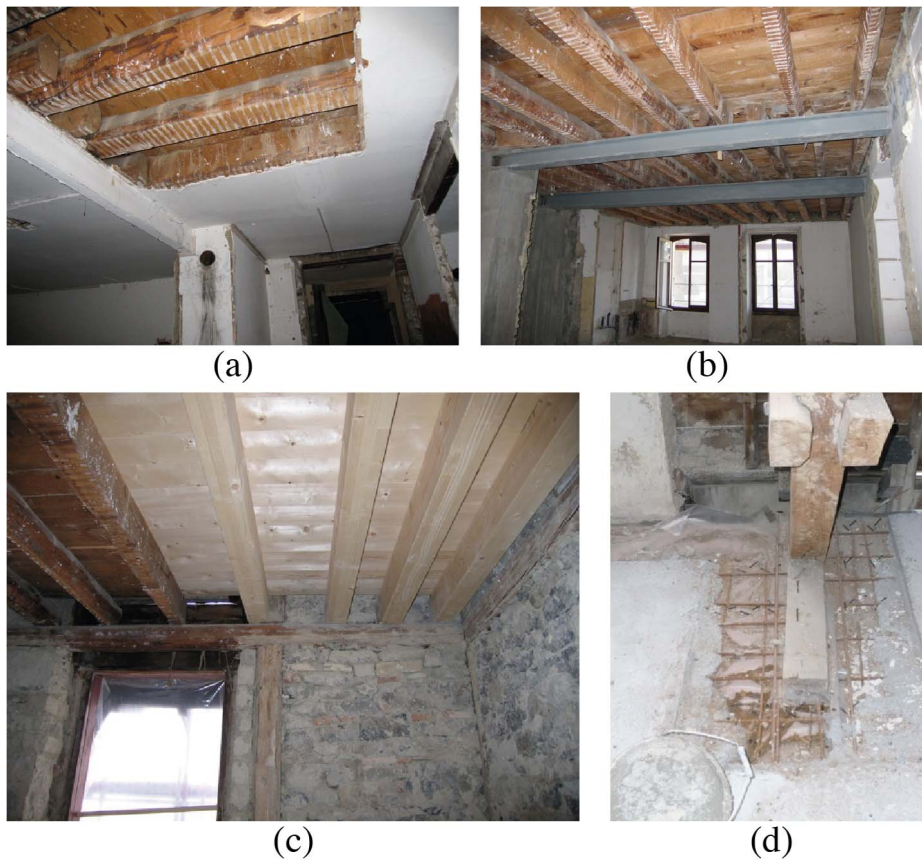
Retrofit of the slabs in the building (a) initial state, (b) added steel beams, (c) renewal of the wooden floors, and (d) added RC slabs.
